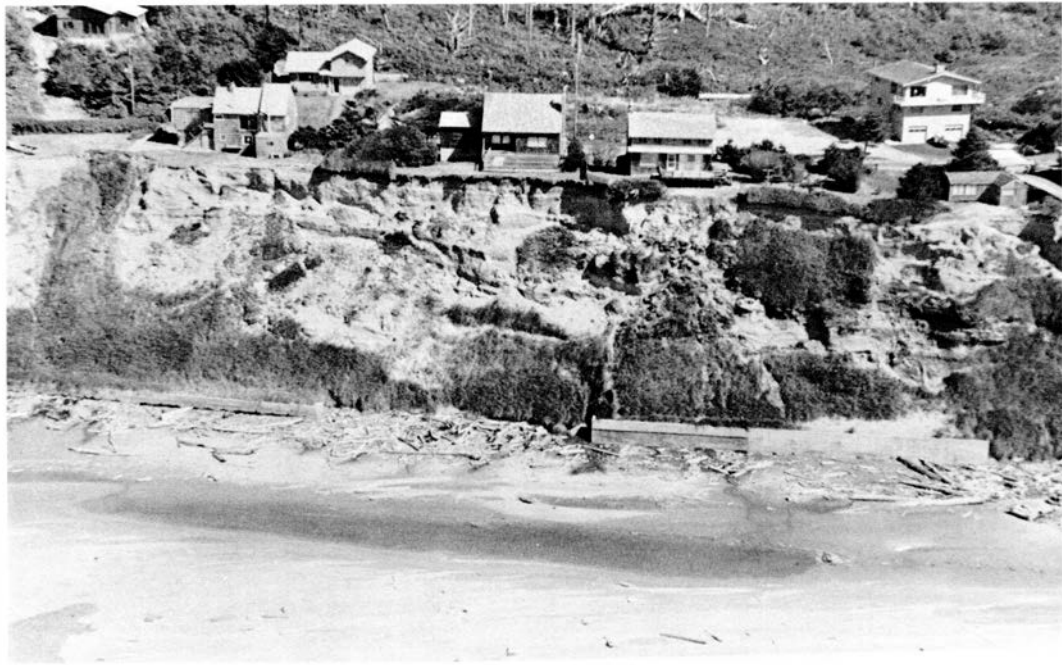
Short sections of concrete sea wall protect lower slopes of sea cliff from wave erosion, but are ineffective for upper, oversteepened portion.
